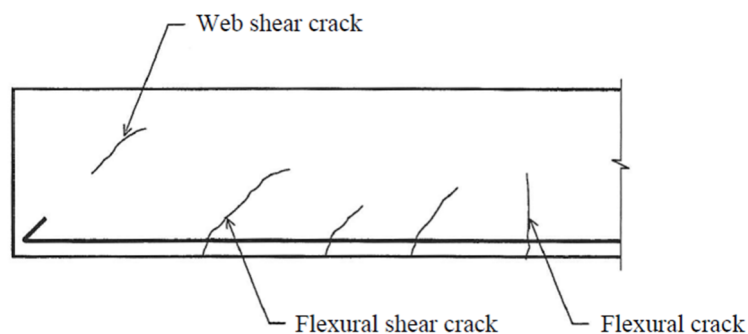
Different types of cracks in reinforced concrete (Al-Emrani et al., 2013).
